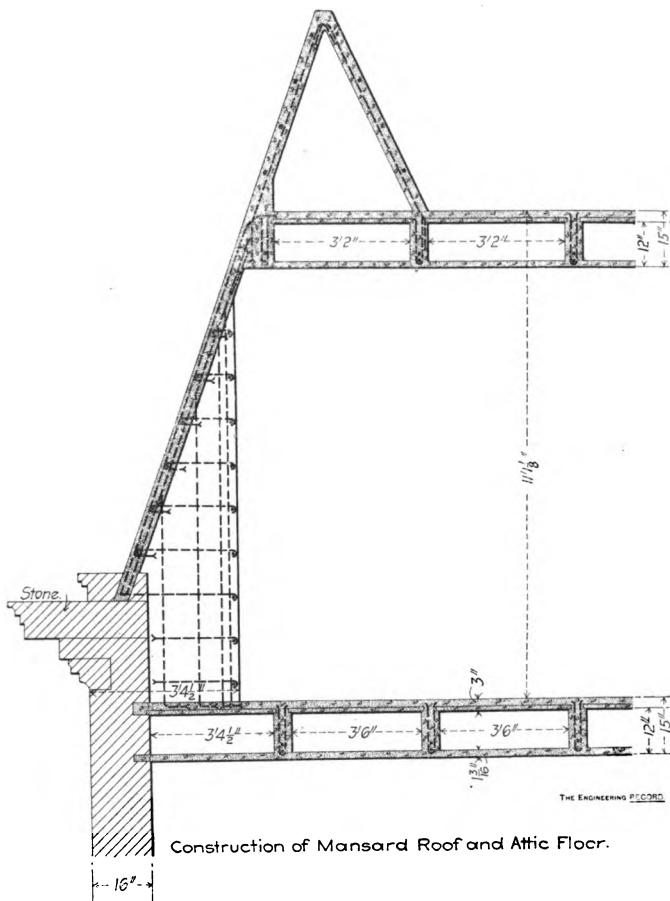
Mansard Roof and Attic Floor, W. C. Sheldon's Residence, New York.
